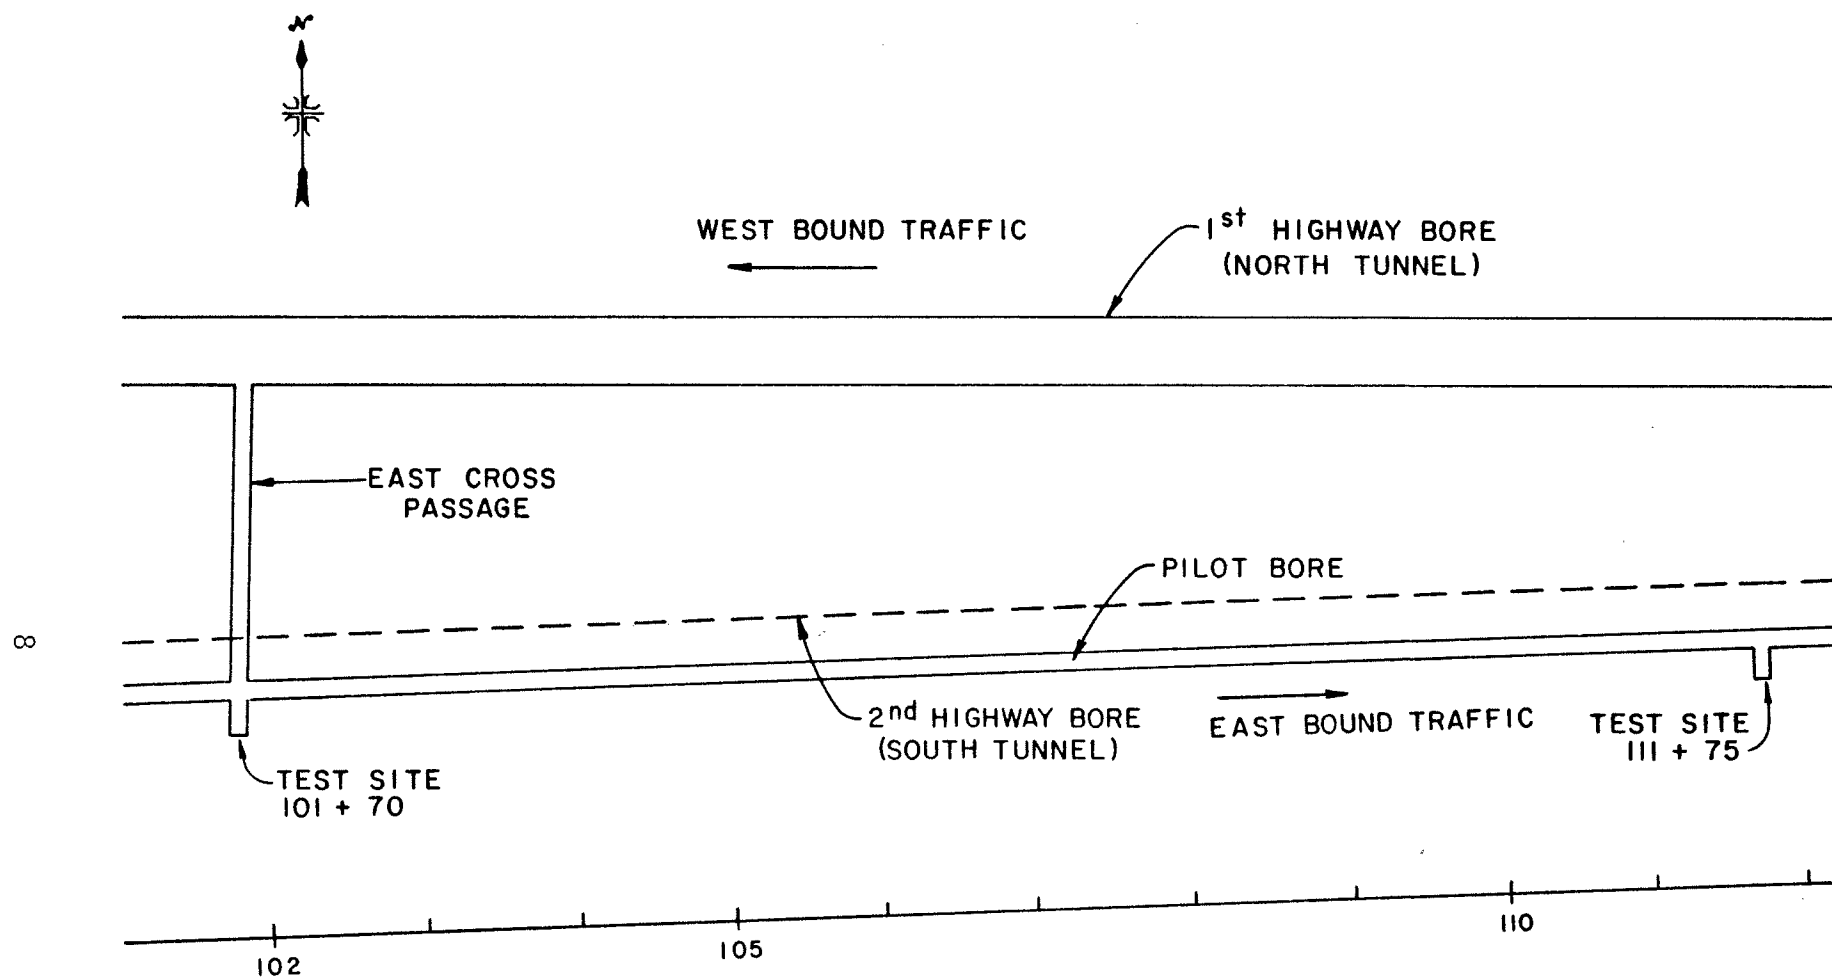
PLAN VIEW OF EISENHOWER MEMORIAL TUNNEL
